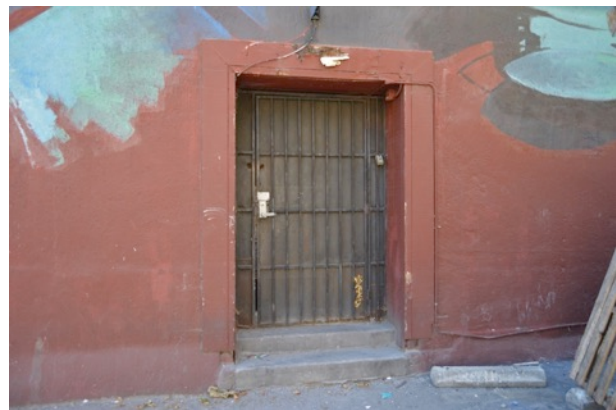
View of northeast elevation, looking southeast from Fountain Alley.
